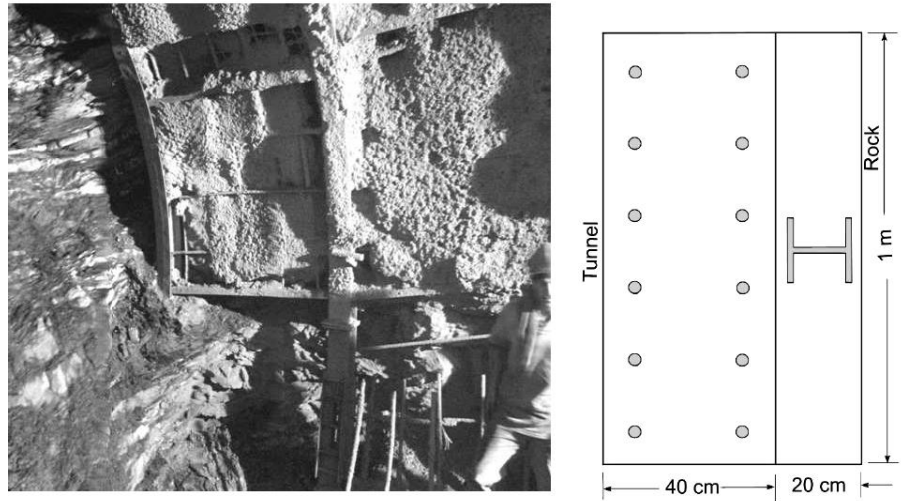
a) Configuration of mid-height bench (partially disintegrated in this photograph) and upper steel arch installed ahead of lower section and sliding joint. b) Final 60 cm section with outer shotcrete and steel set composite section and inner reinforced shotcrete section. The tunnel is to the left and rock mass is to the right of the section.
